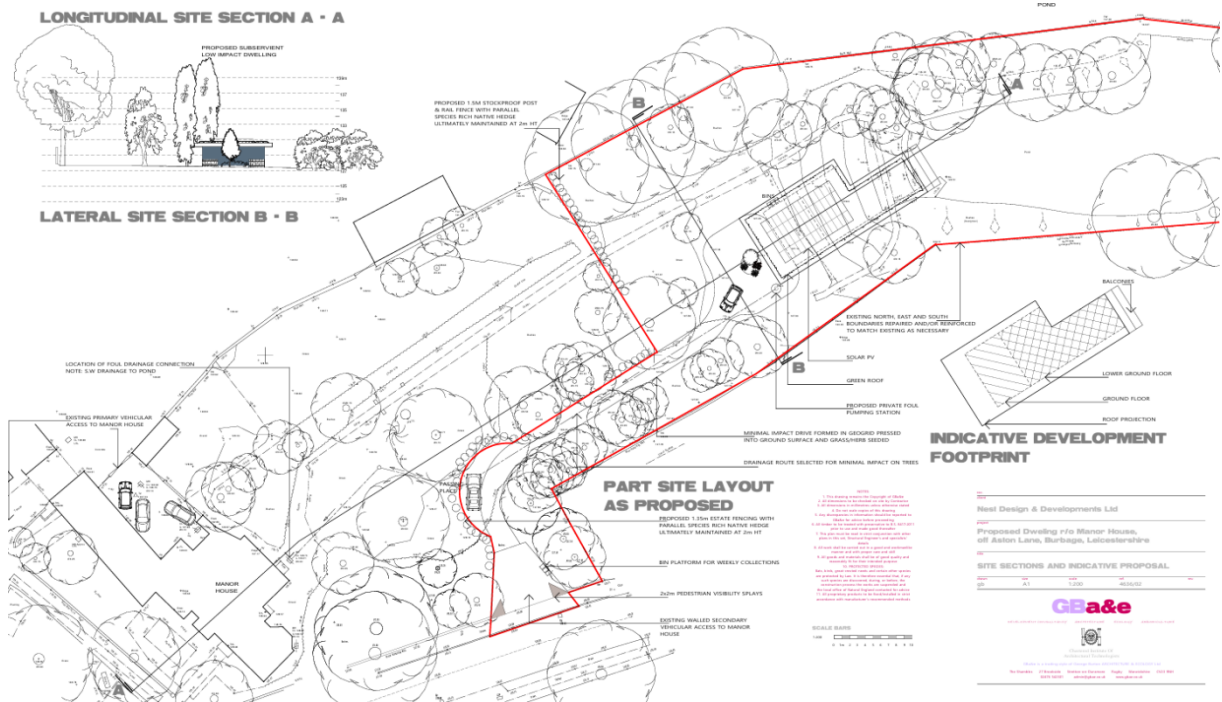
Proposed landscaping Plan: SITE SECTIONS & INDICATIVE PROPOSAL
